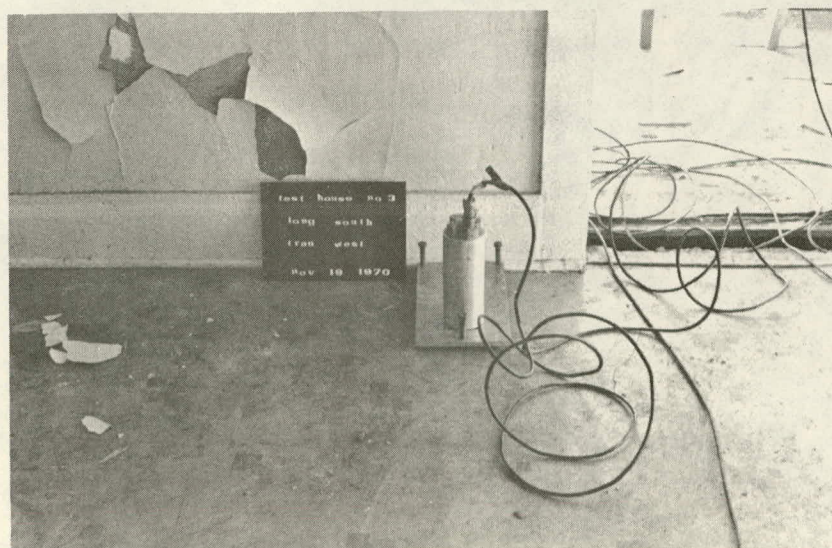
Station #3, Test House #3, seismometer location for Nov. 19, 1970, first floor south of the house.
